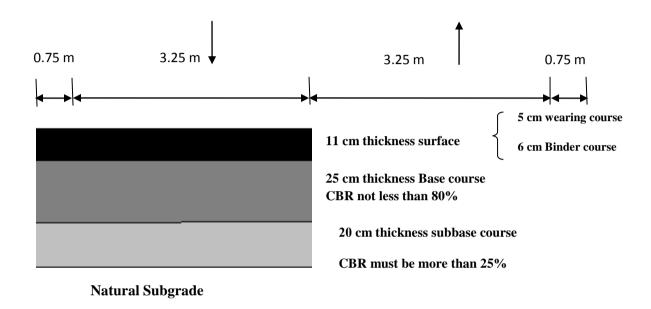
cross section and pavement layer thickness in secondary roads (OECO, 2008)
